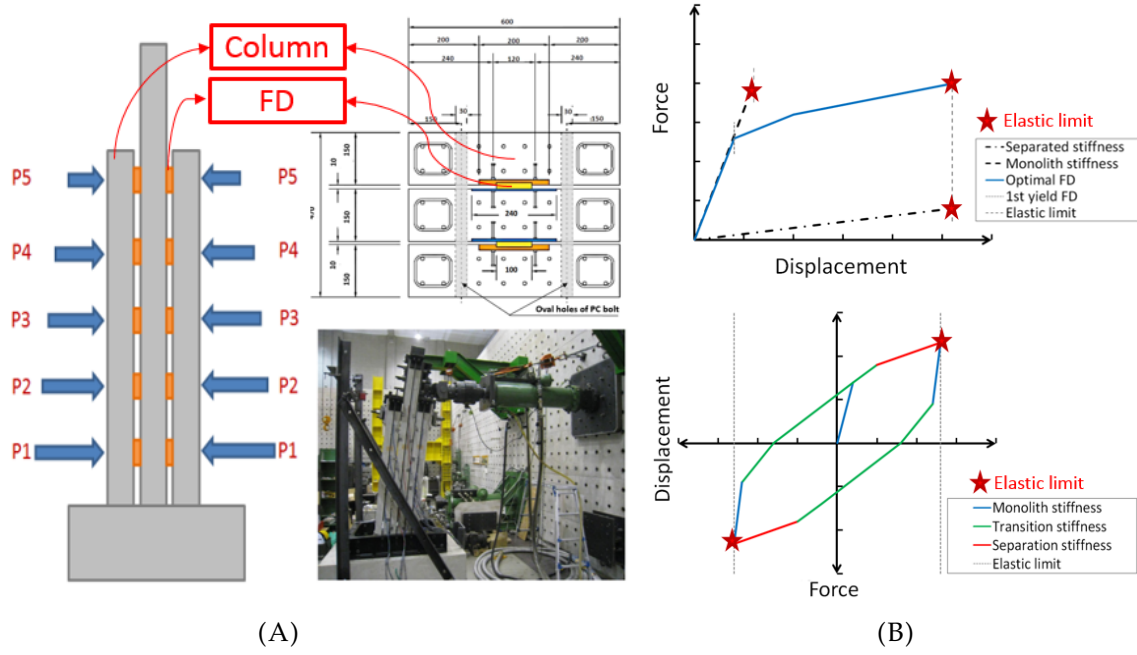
Columns connected by the friction dampers (FD) [35]: (A) specimen of the structure and (B) the structural concept.
